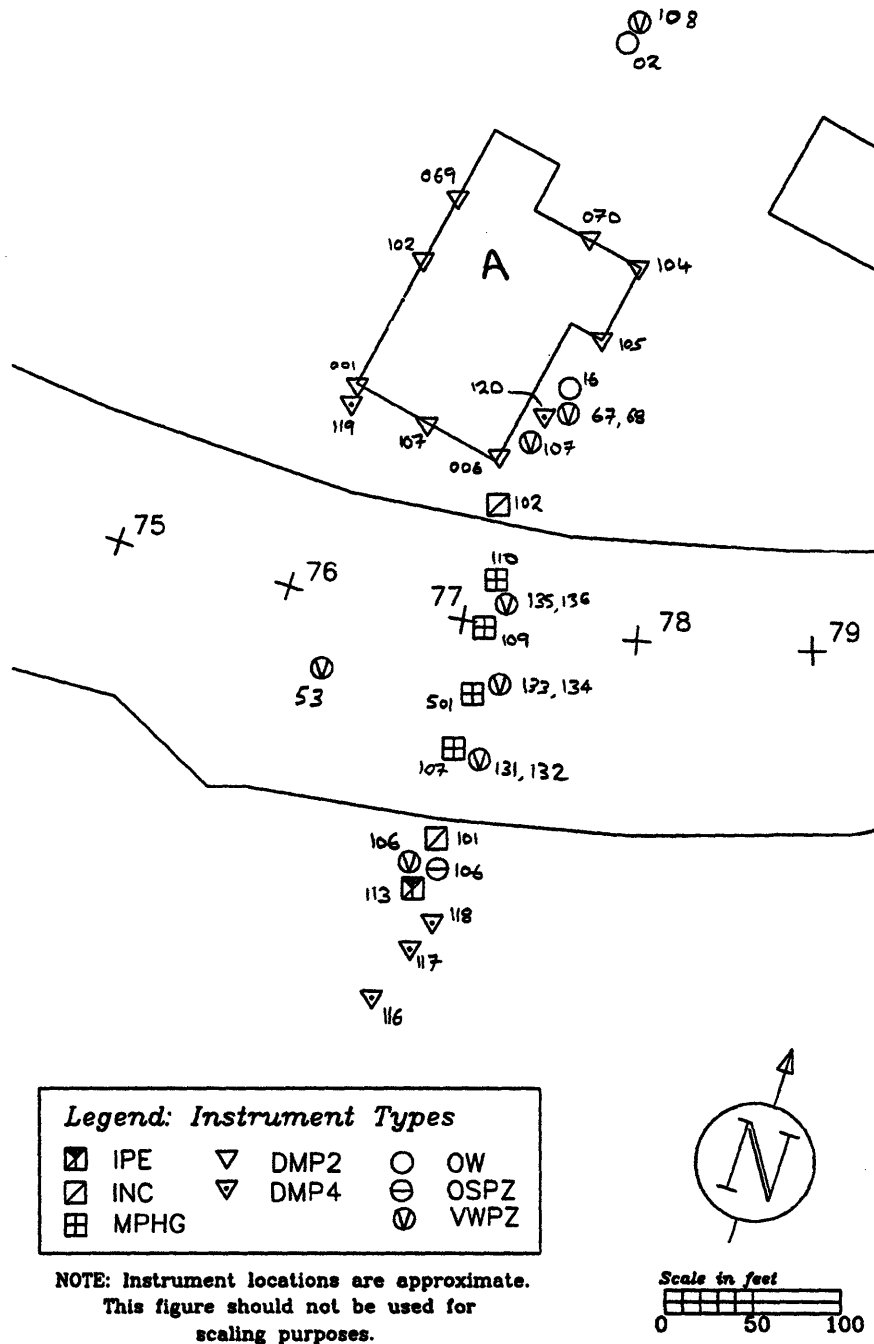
Plan View of the ISS-4 Area, showing Building A and Geotechnical Instrumentation.
